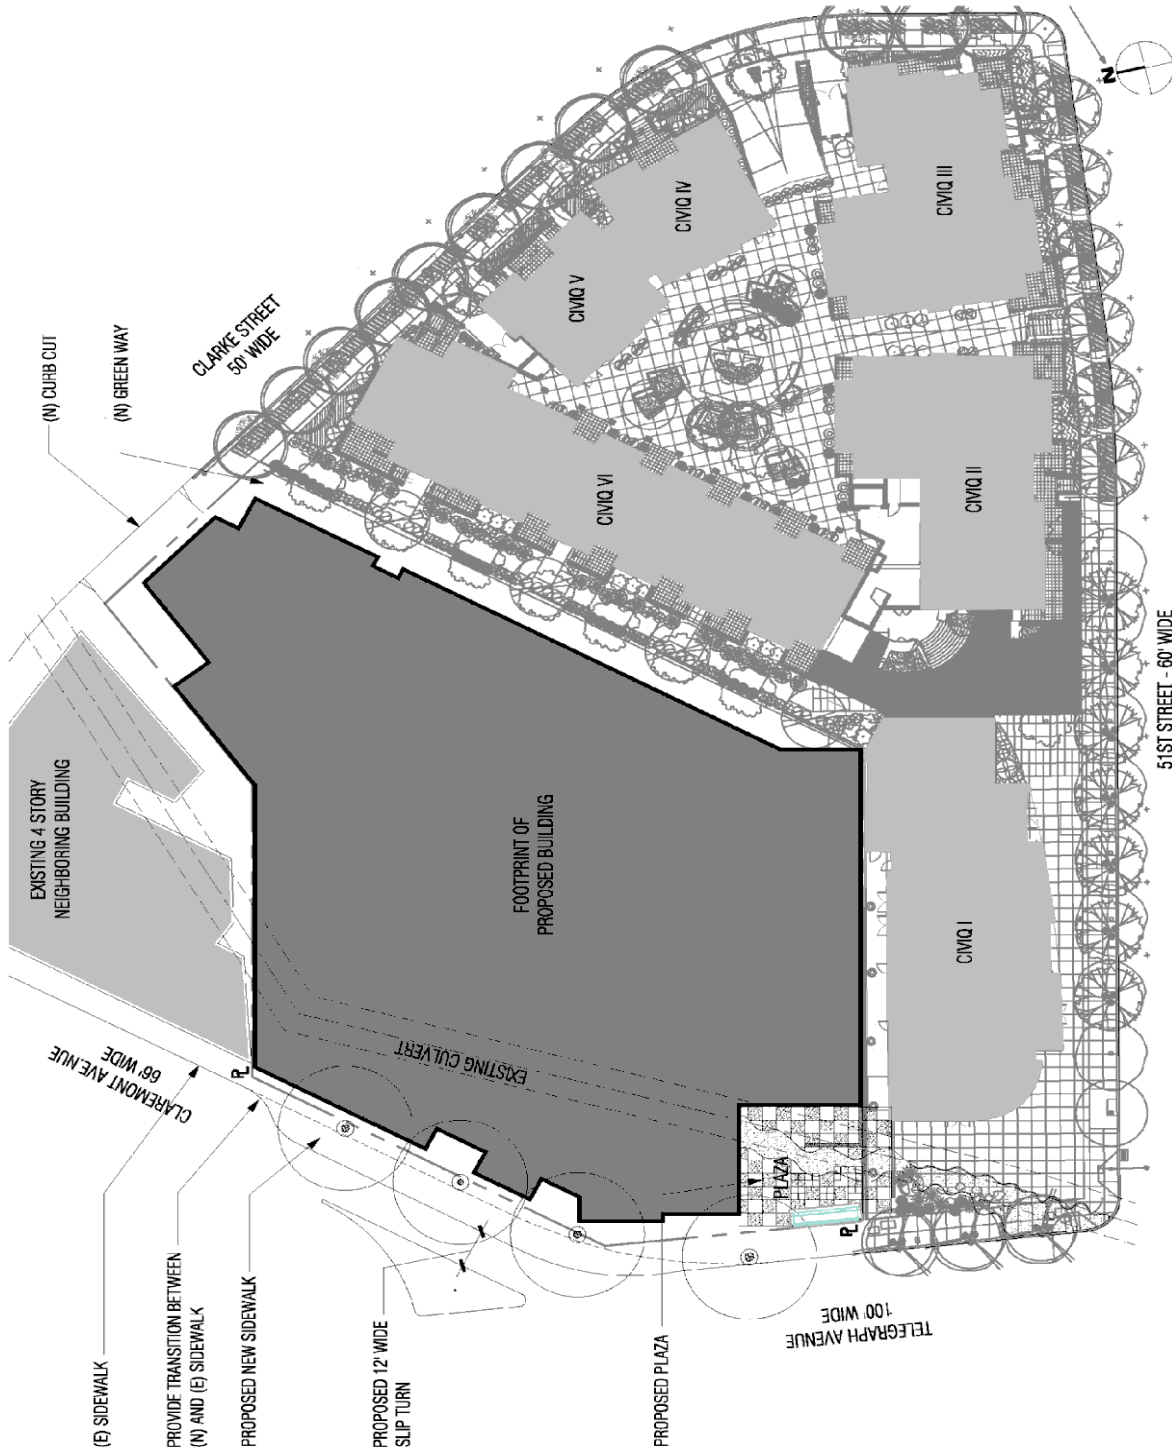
Conceptual Site Plan. Source: Hauser Architects.
